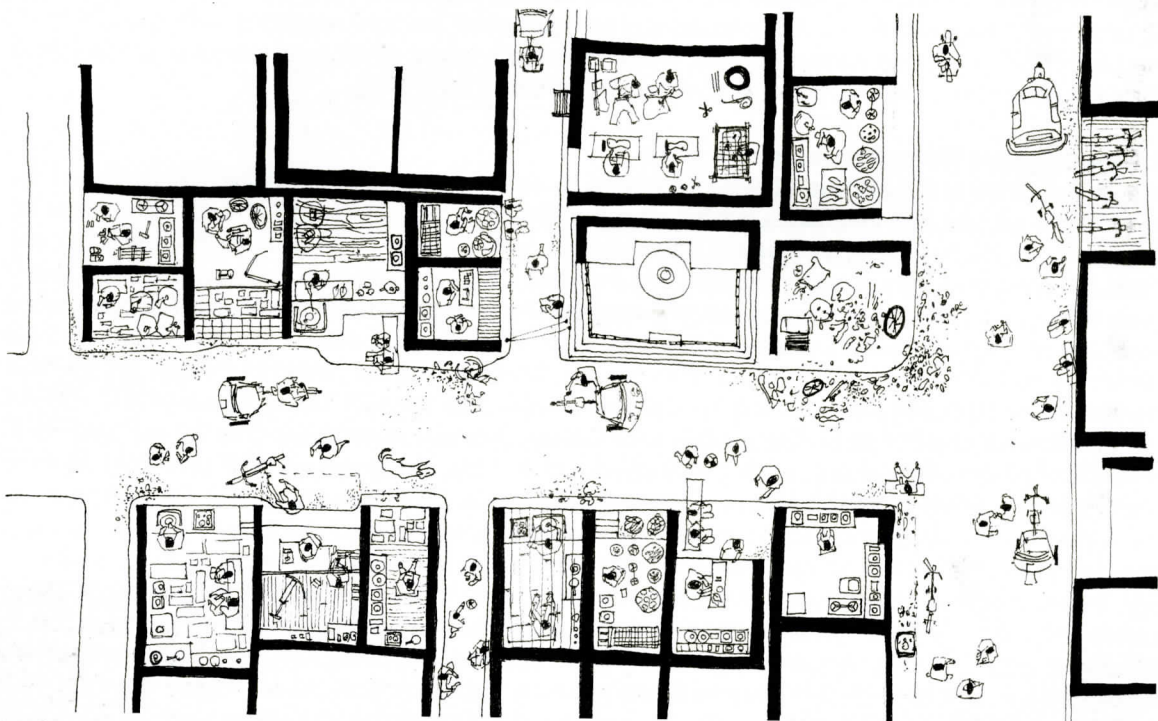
Dwelling units placed on two sides of common walls and the narrow streets flanked by them
